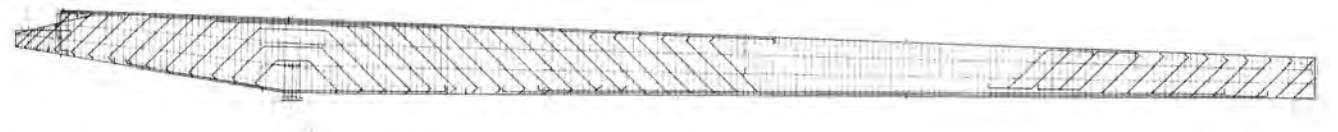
Arrangement of side span and cantilever reinforcements with Gerber saddle
